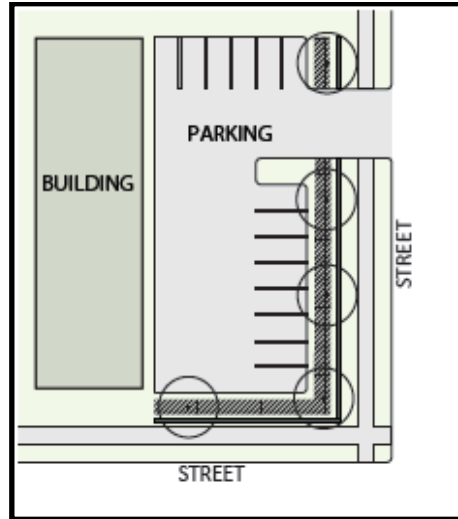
Landscaping Buffer with Evergreen Plantings—Plan View
